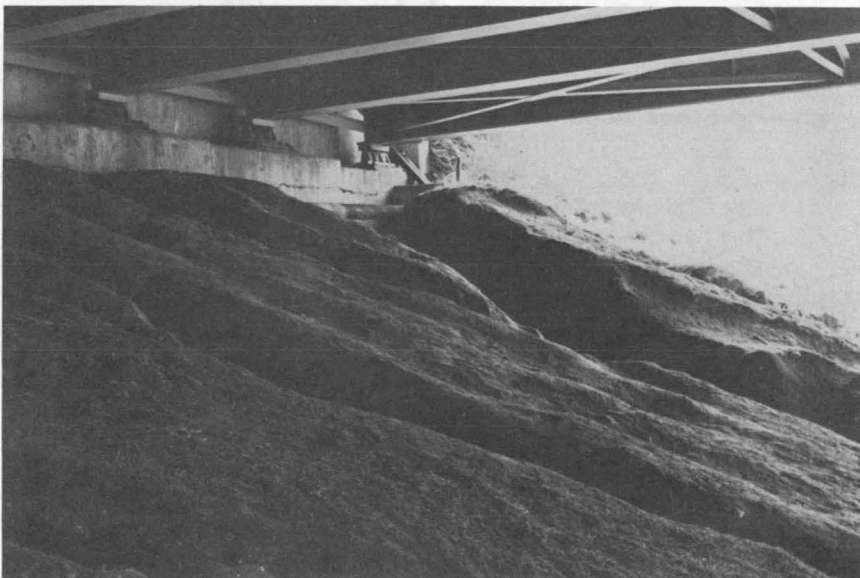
Soil erosion on abutment slope due to deck drainage.
